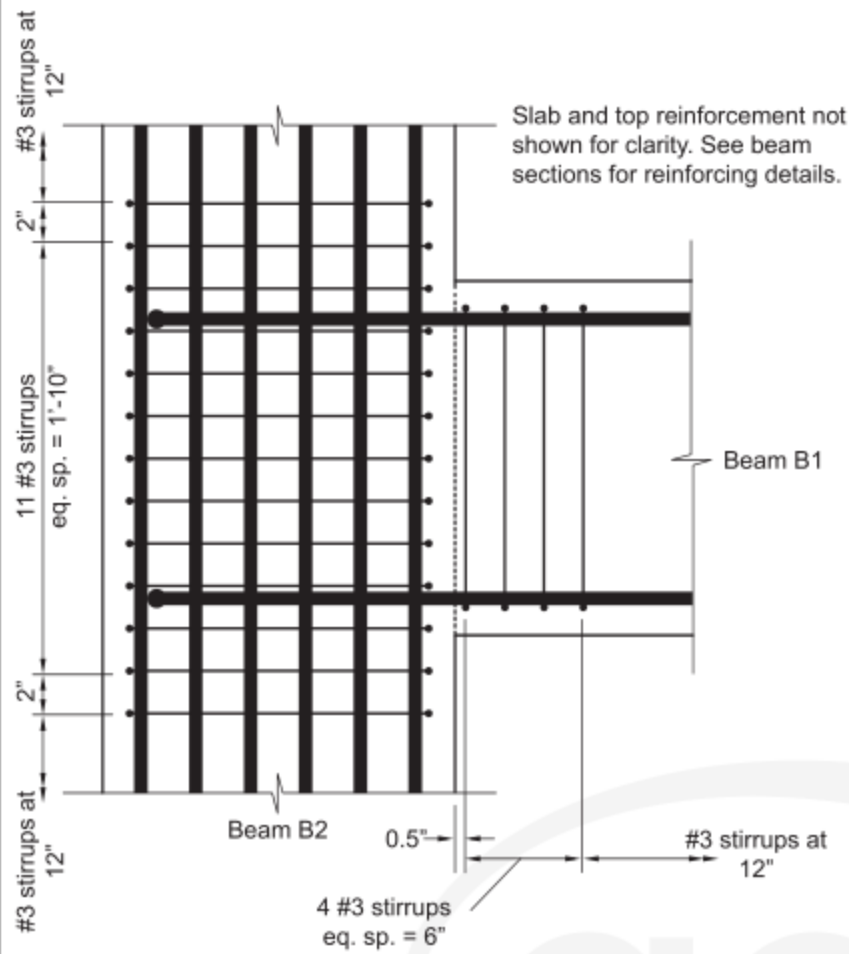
Plan section of intersection of beams B1 and B2.
